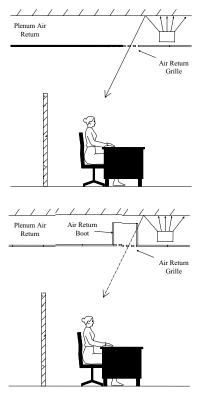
Install boots above open return air ducts in ceiling plenums.
